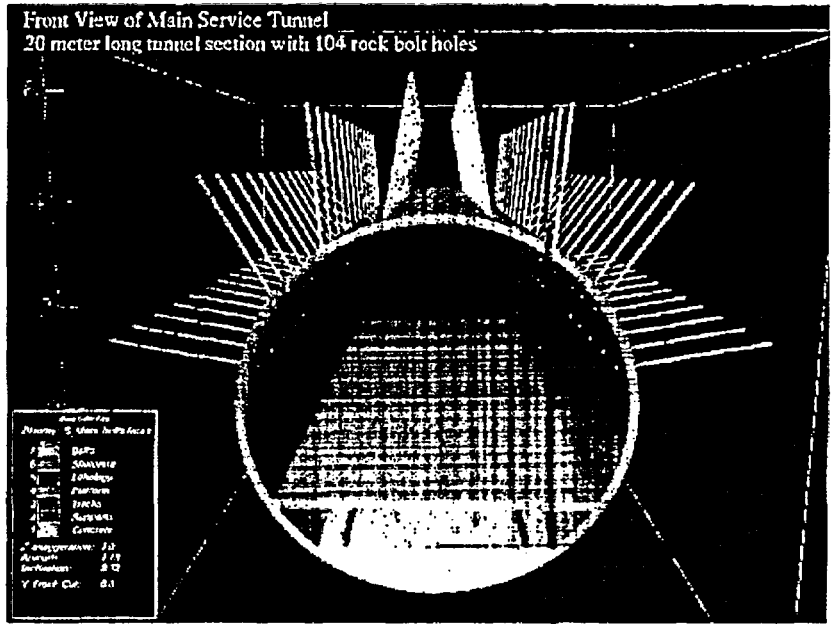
Cross-sectional rendering of 20-m section of 7.6-m diam. service tunnel showing rockbolt holes
